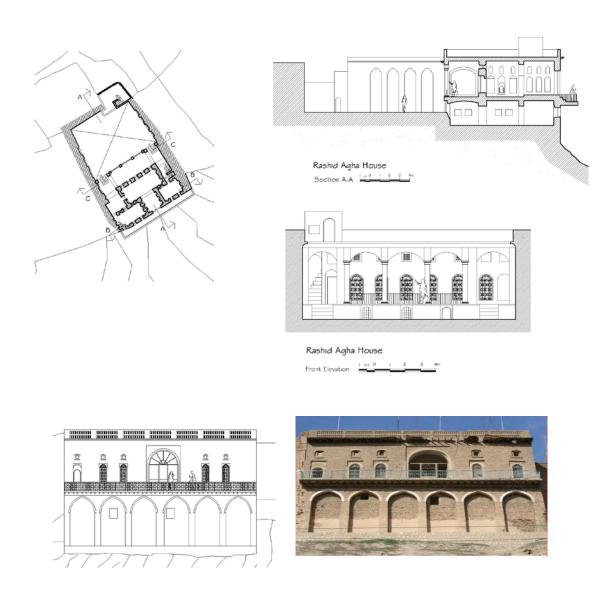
Documentation of Rashid Agha House inside Erbil Citadel Source: Conservation Master Plan-Erbil City, 2009
